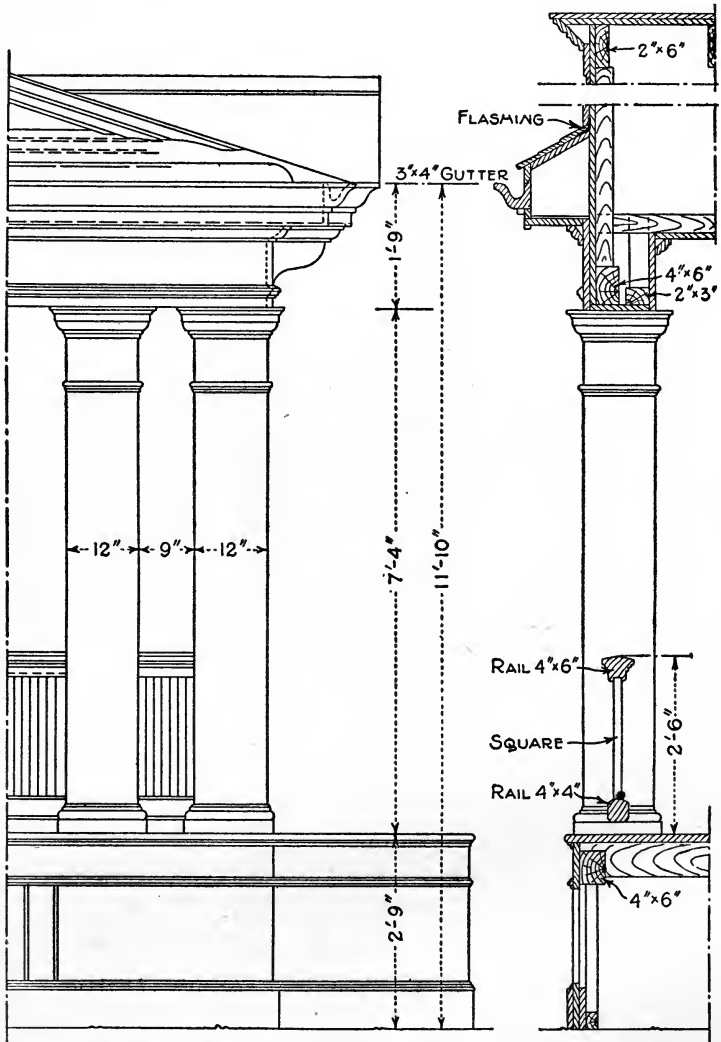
ELEVATION AND SECTION OF FRONT PORCH—SCALE  $\frac{3}{8}$  IN. TO THE FOOT
